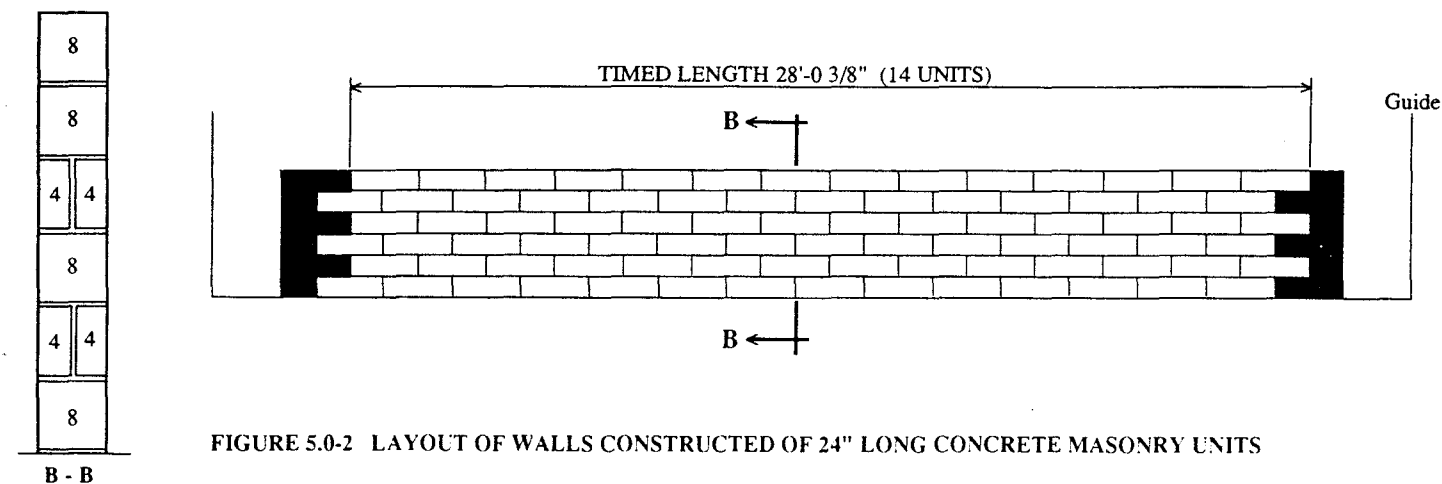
LAYOUT OF WALLS CONSTRUCTED OF 24" LONG CONCRETE MASONRY UNITS
